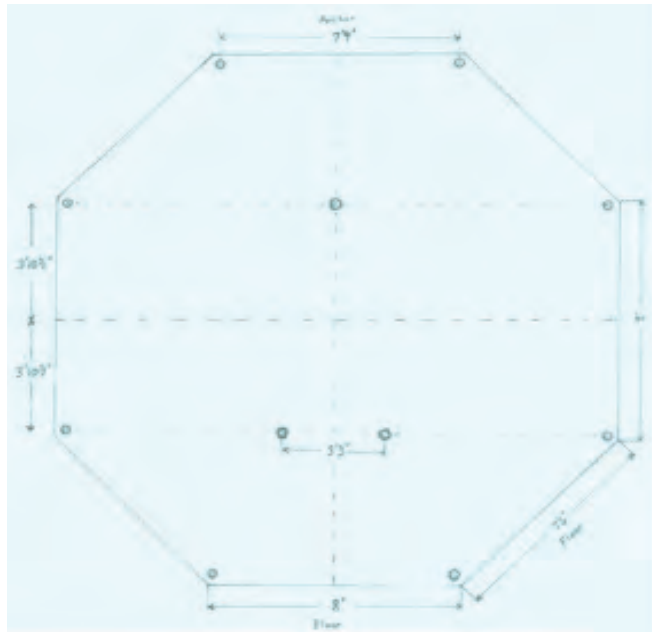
The layout of the 5" upright posts and the adjoining rebar coupler layout from figure 7.5; it also shows the measurements and the basic floor plan. The couplers are placed off the dotted center lines and the perimeter couplers are more accurately described in figure 7.5 which is an enlarged depiction of the indicated section.
